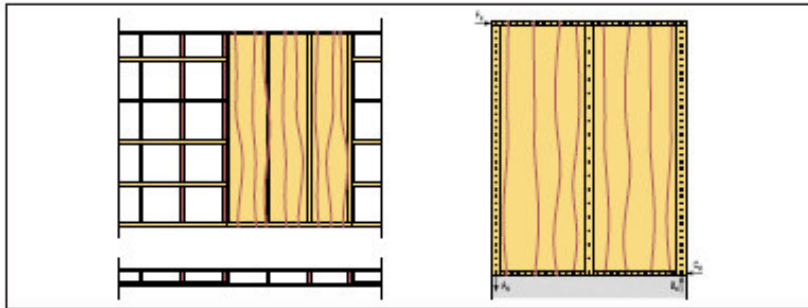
Robust LVL-C bracing panel integrated into the wall structure.
